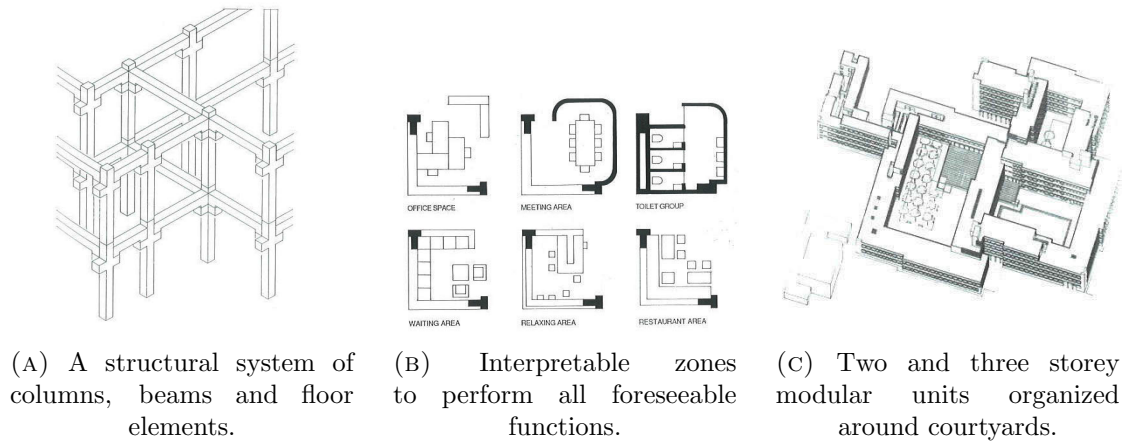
Load-bearing structural framework, independent of the walls, doors and ceilings, etc. In addition, the buildings are built to take more floors on top, as a way of supporting continuous changes and extensions. *Source:* (Hertzberger, 2005, p. 127–133).
